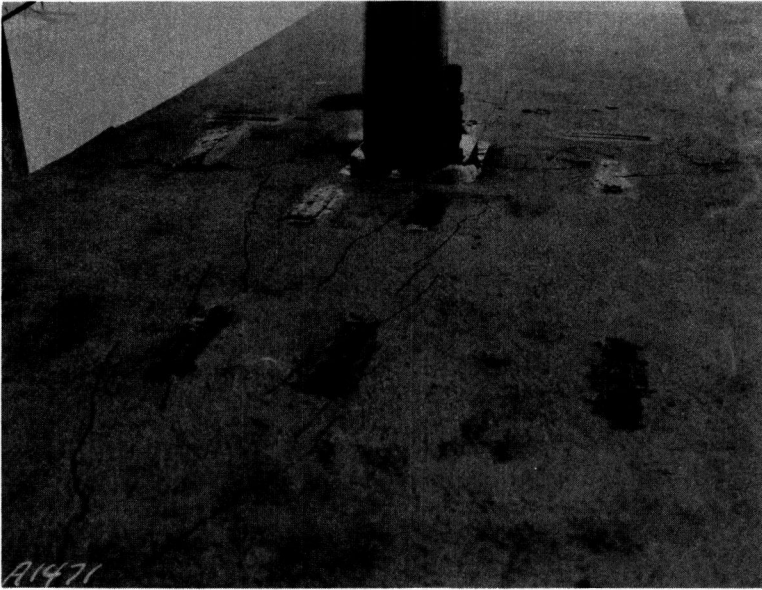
Slab-cracking pattern, composite shear test, pretensioned beam.
